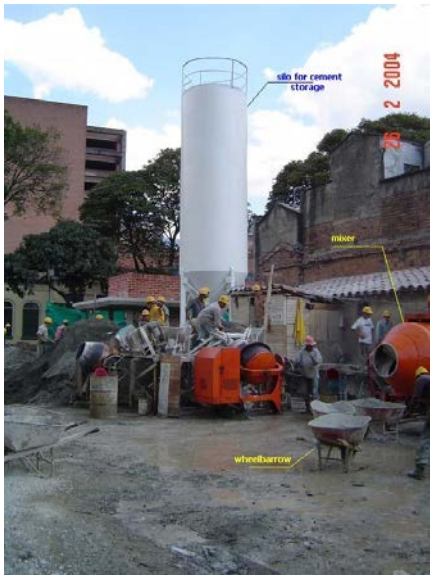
Concrete producer plant on building site. OPTIMA S.A. construction project.
